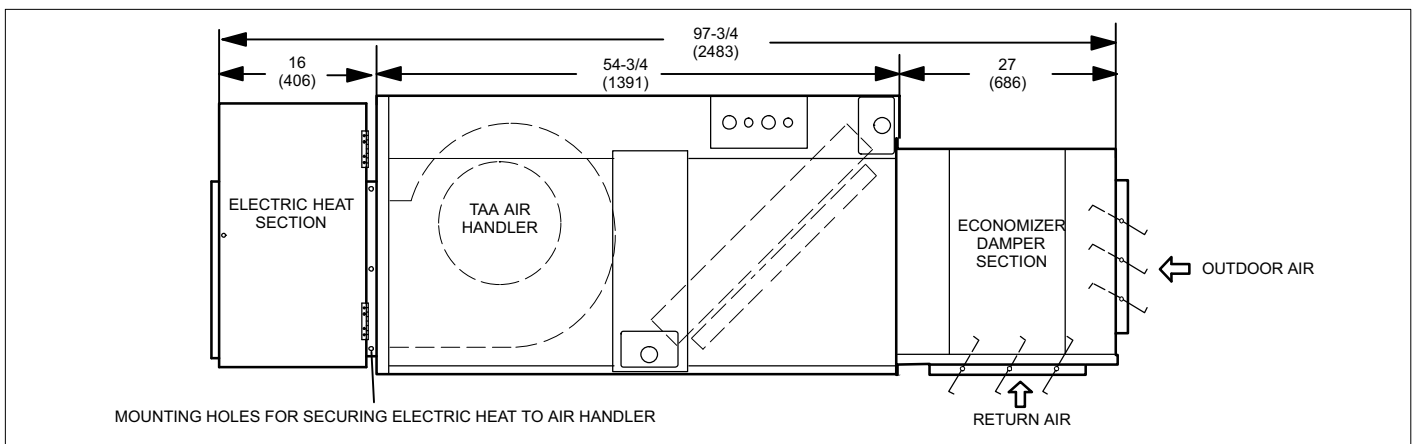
TAA 120 and 150 Knockout Location - Dimensions - inches (mm)
